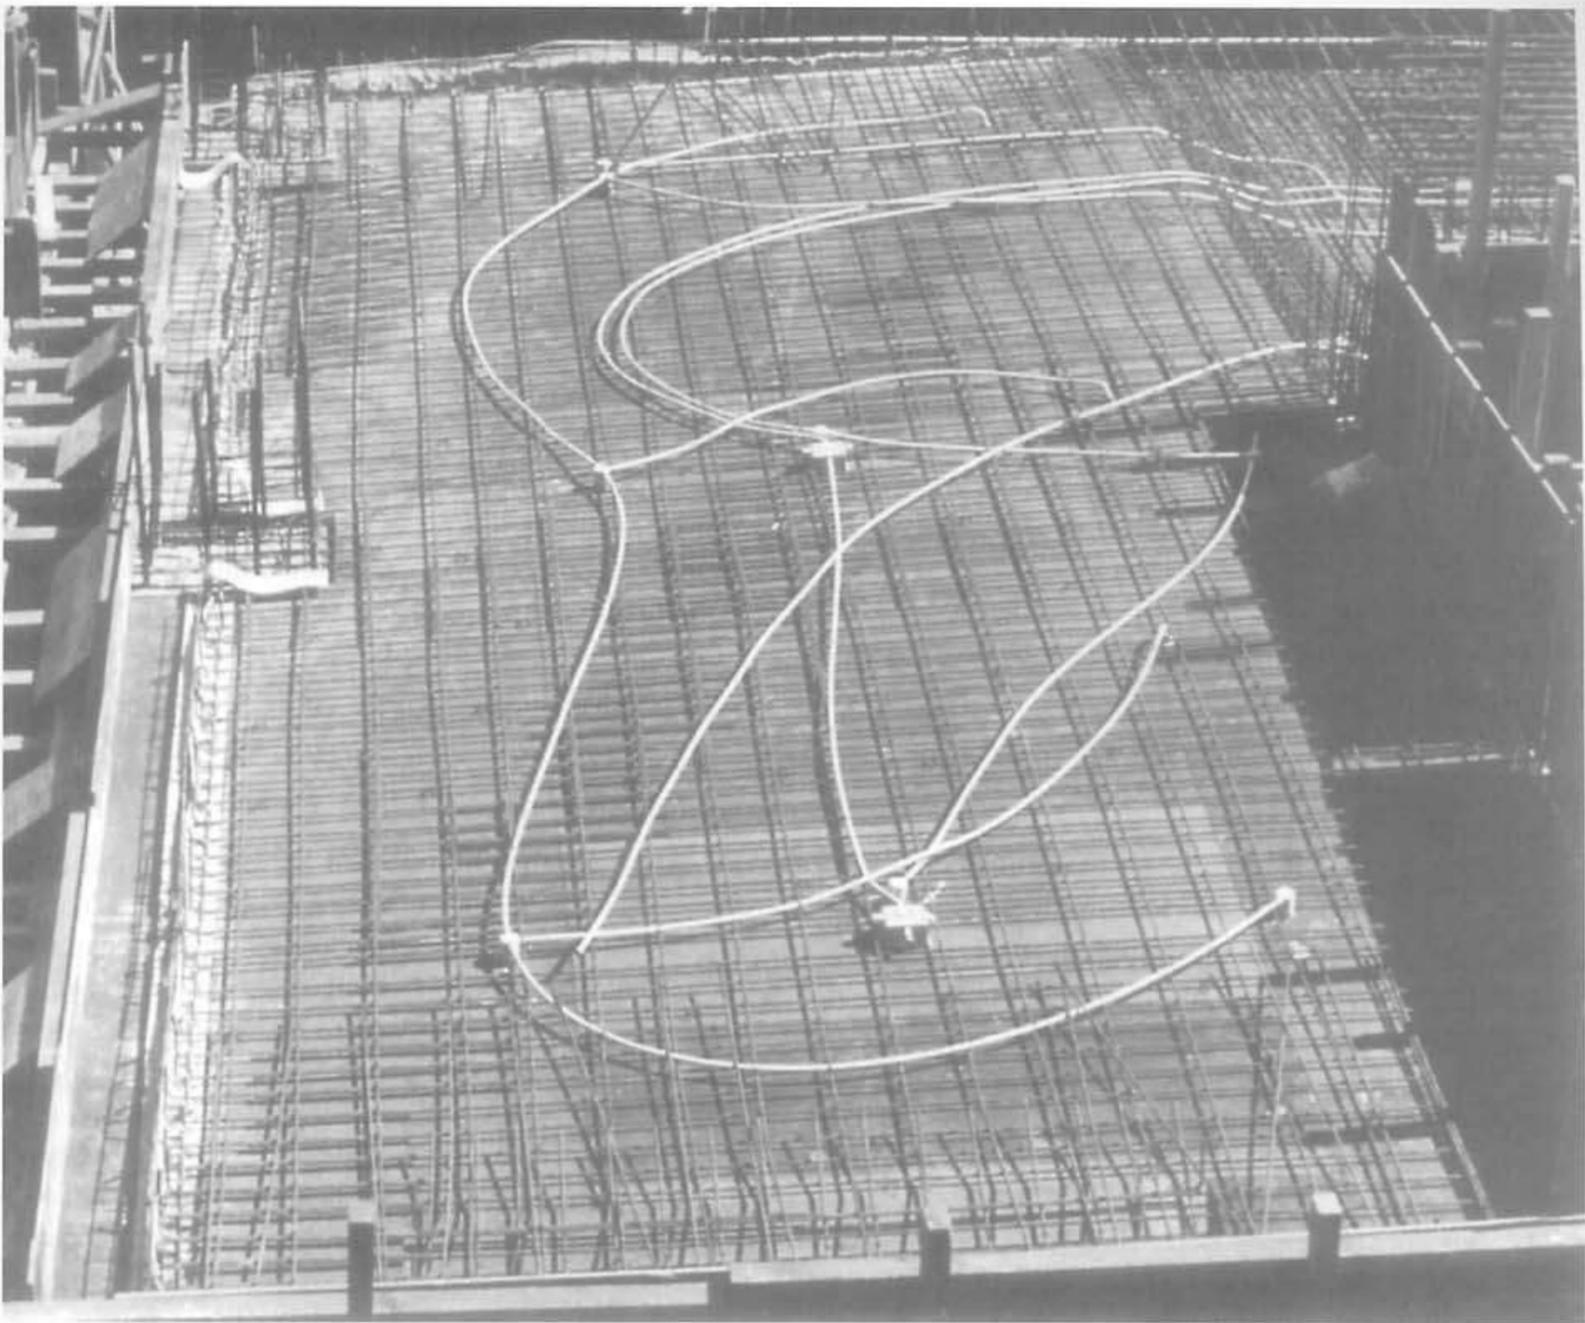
Installation of conduit in a concrete slab, prior to the pour
